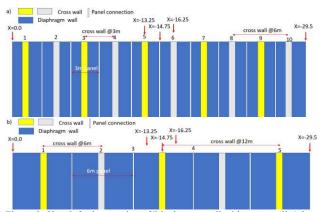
Sketch for layout plan of Diaphragm wall with cross wall a) 3m panel with 3/6 m cross wall spacing, b) 6m panel with 6/12m cross wall spacing.
